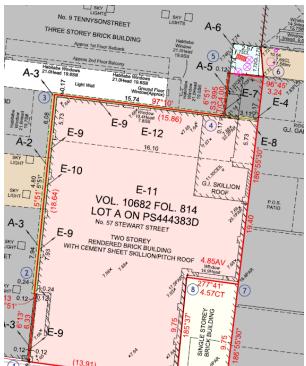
and E-12 easements proposed to be removed shown on the survey plan Source: Reeds Consulting
